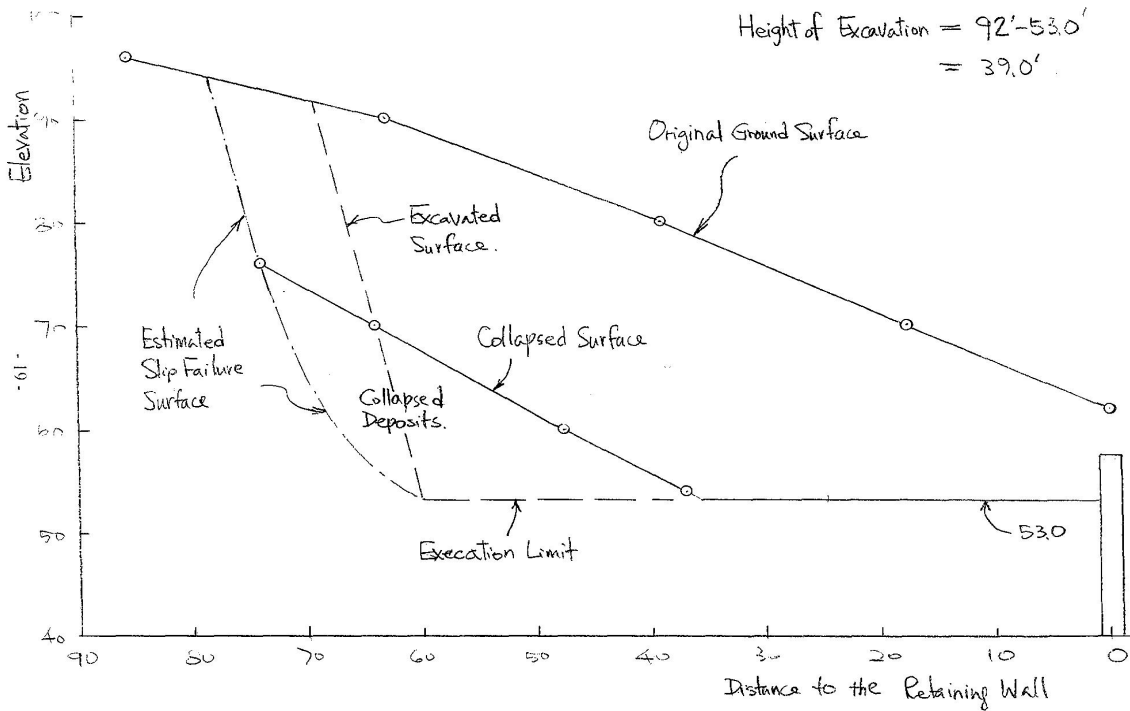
Cross Section of the Original Ground Surface, the Excavated Surface and the Failure Surface in the Collapse Area (70 feet from the turning Point of the Retaining Wall).
